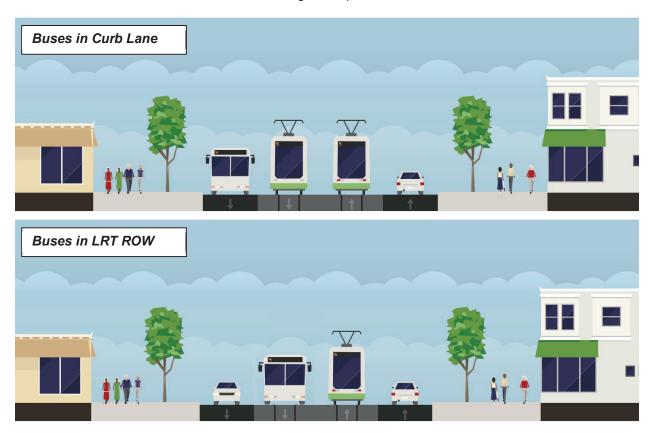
Centre Street N (Bow River Bridge to 16 Avenue N) BRT Options
